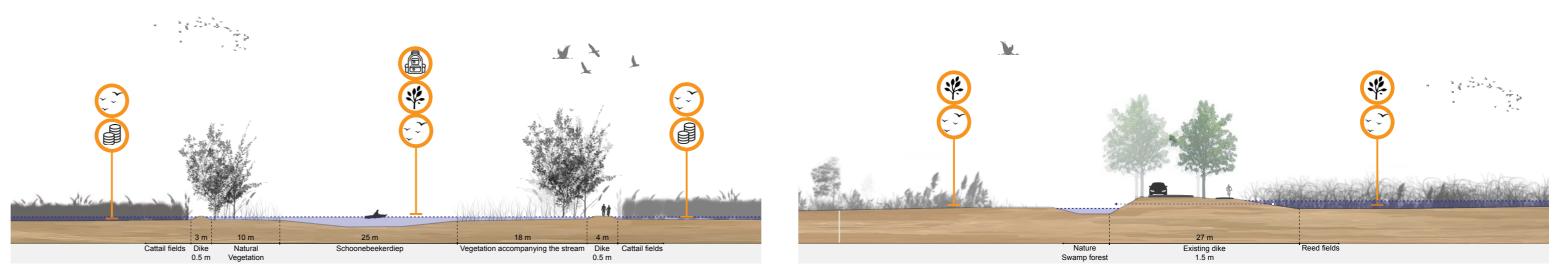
Section A-A': Remeandering Schoonebeekerdiep
